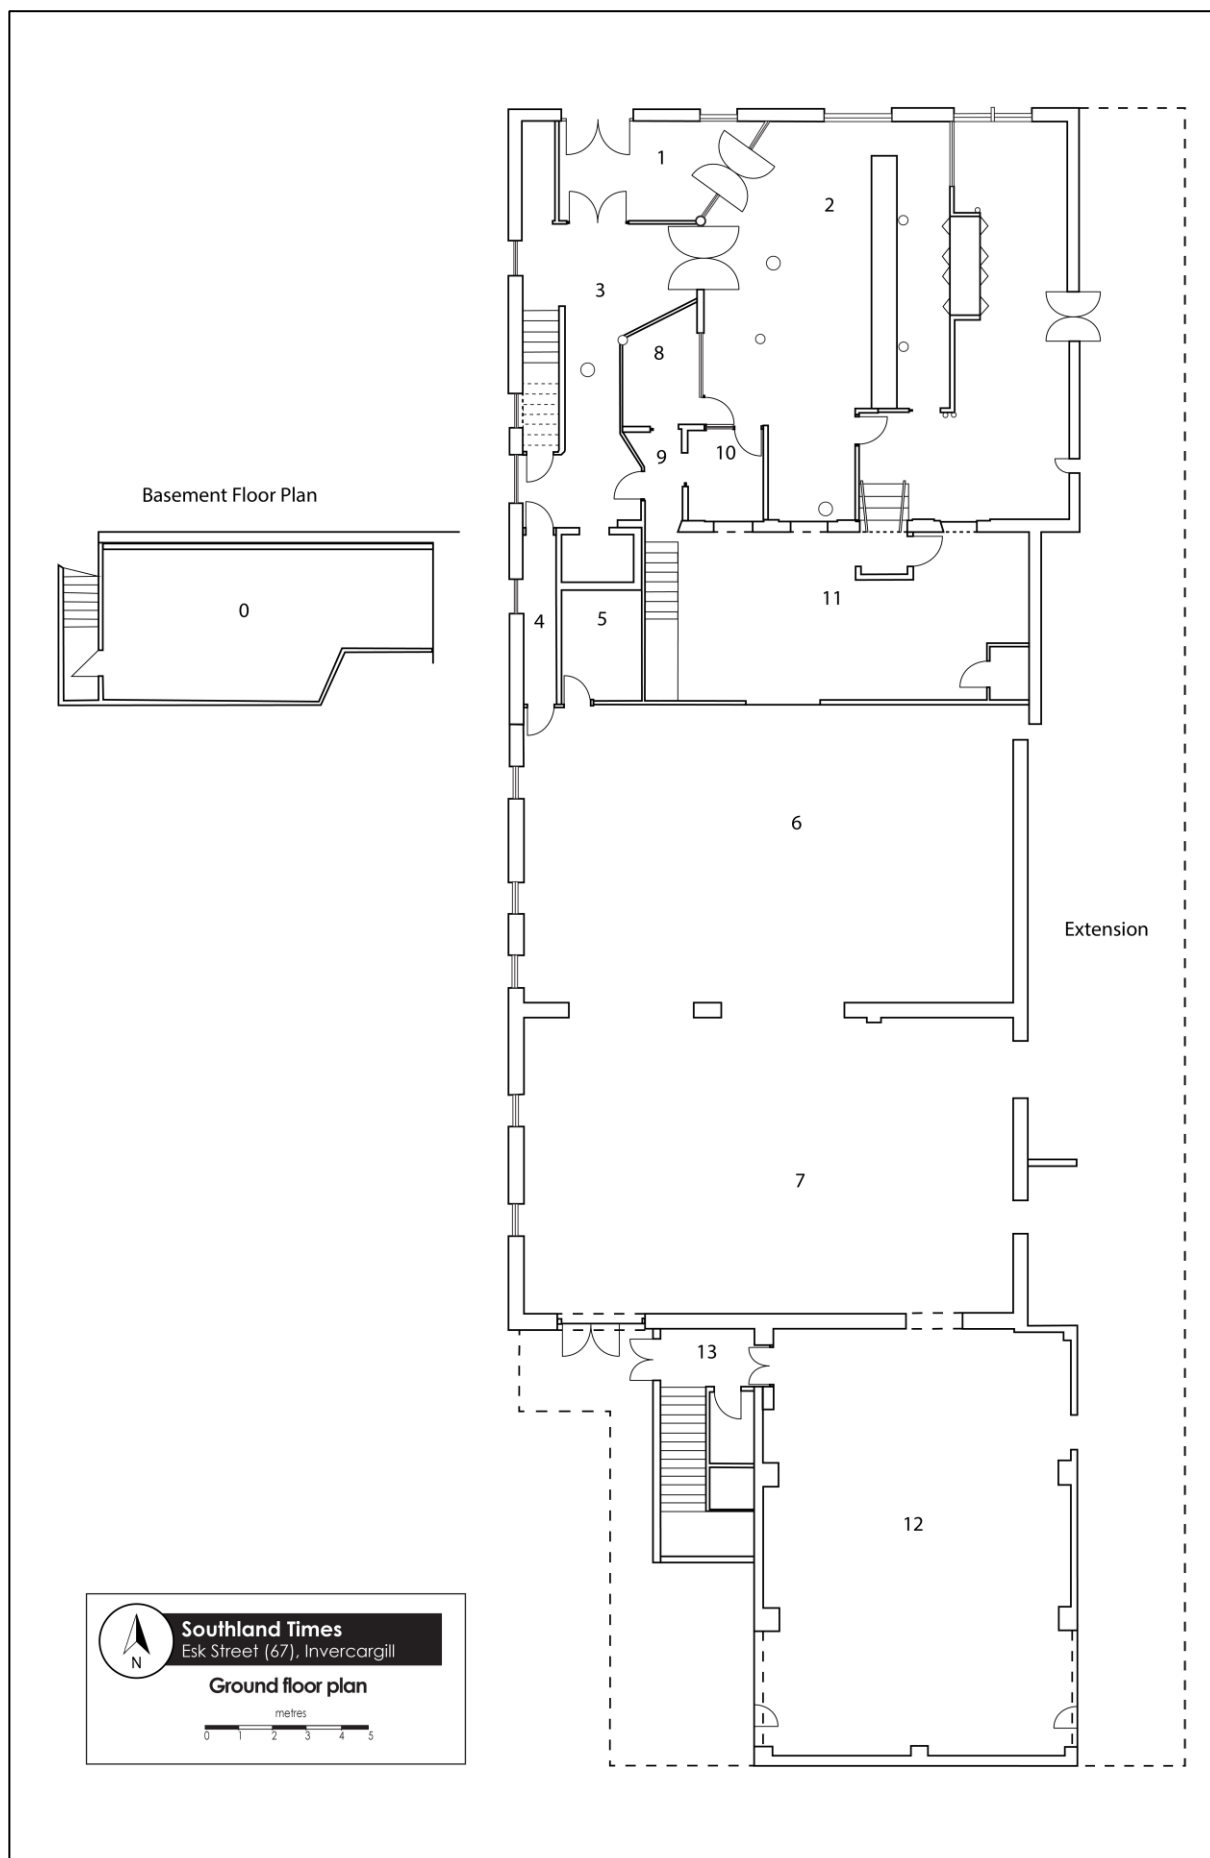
Basement (left) and ground floor (right) plan of the Southland Times Building.
